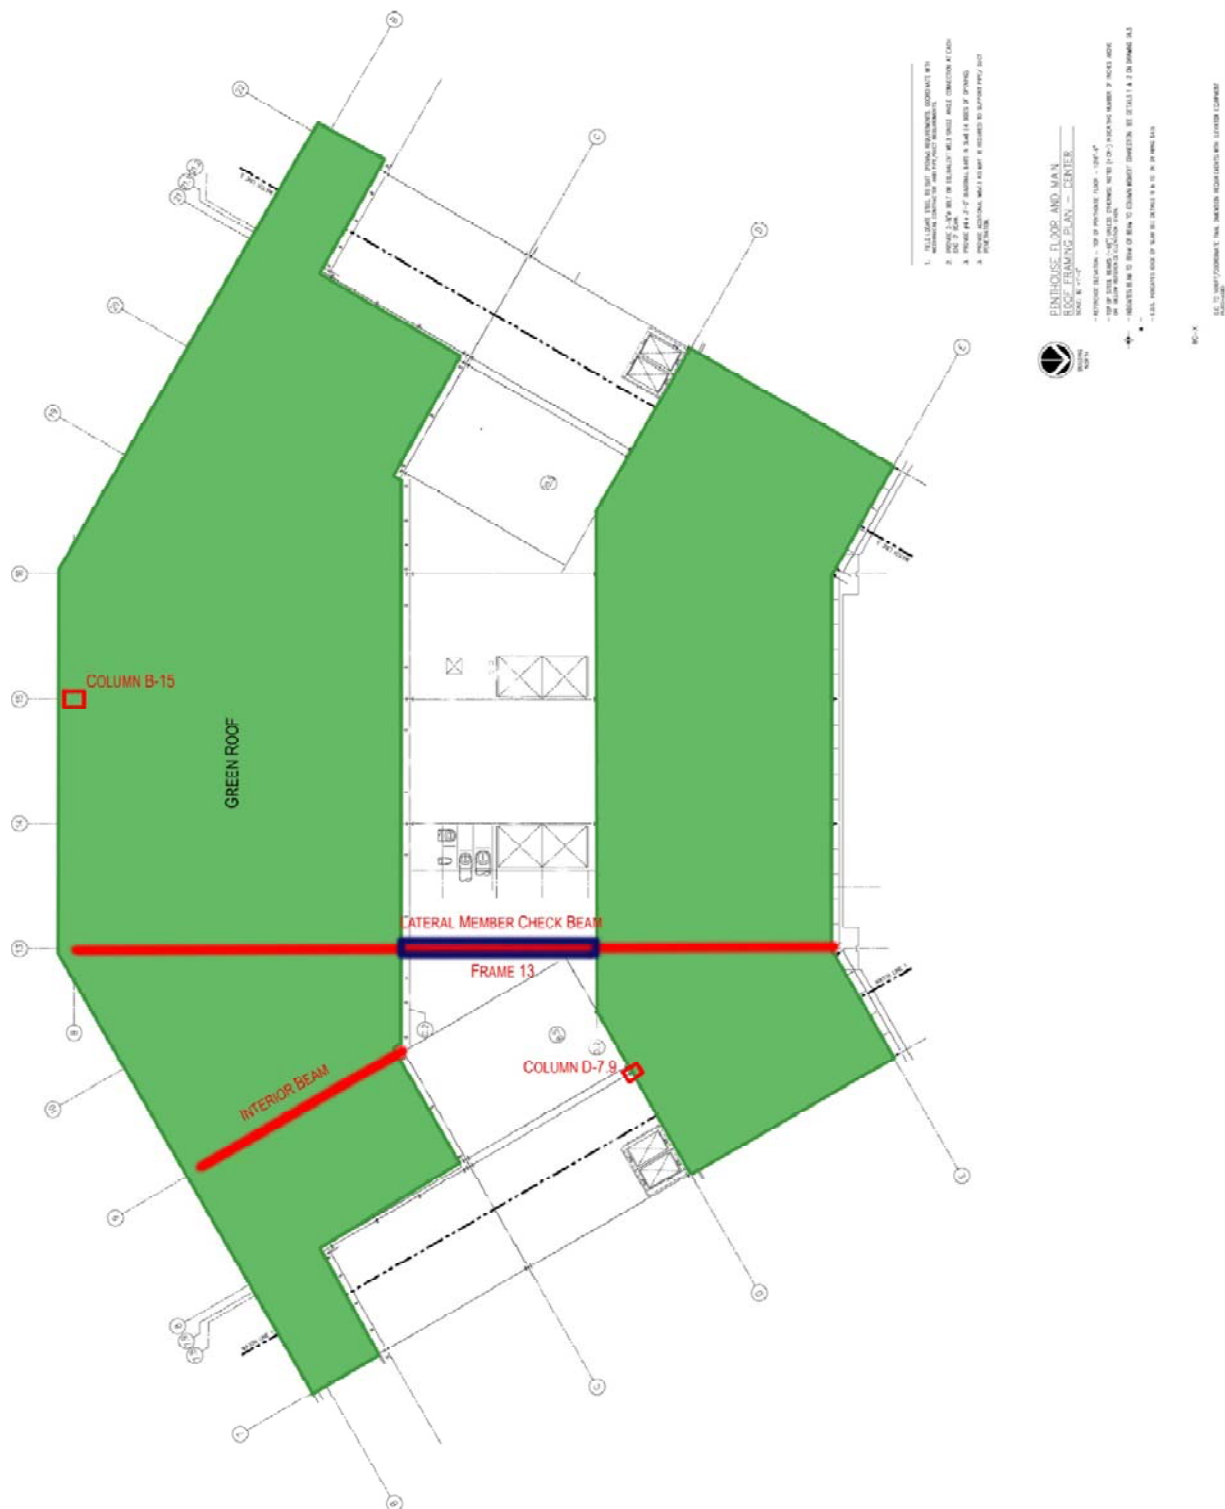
Green Roof Plan Center of Redesigned Building with Portal frame Analysis, lateral Beam Check, Interior Beam Check, and Spot Checked Columns Indicated
